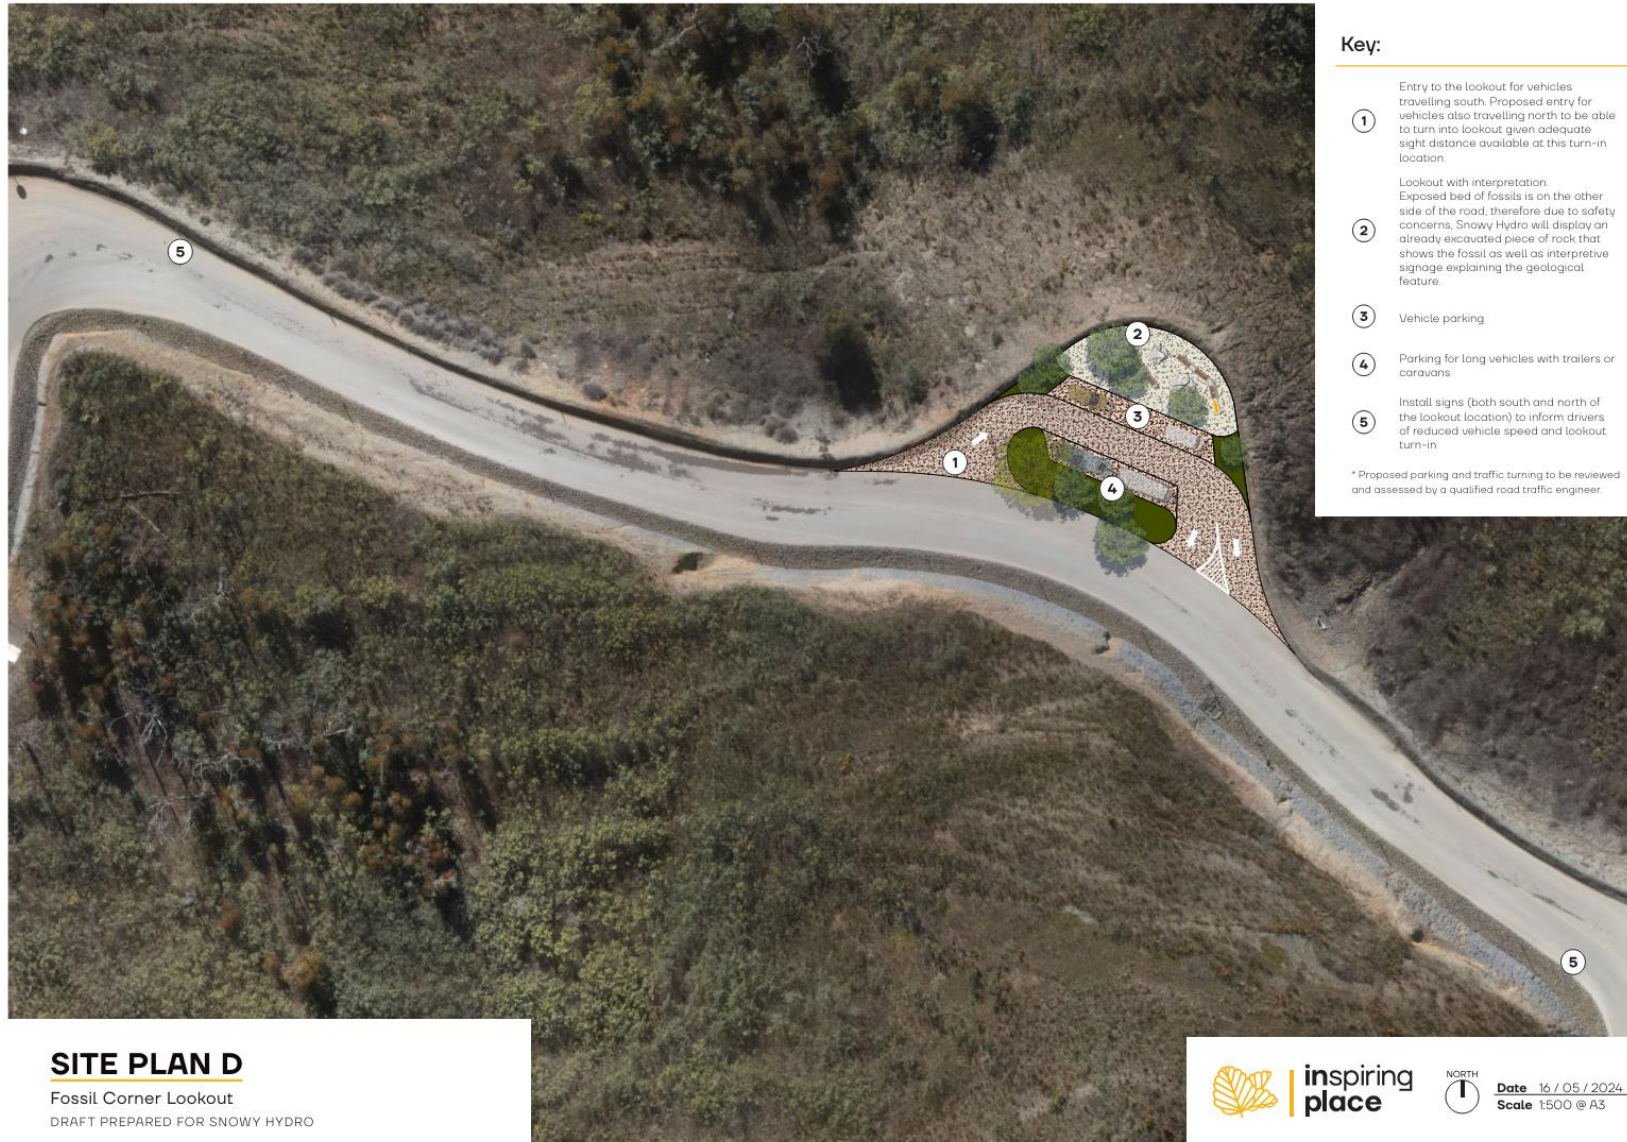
Recreation Precinct 1 Detailed Design – Fossil Corner Lookout
